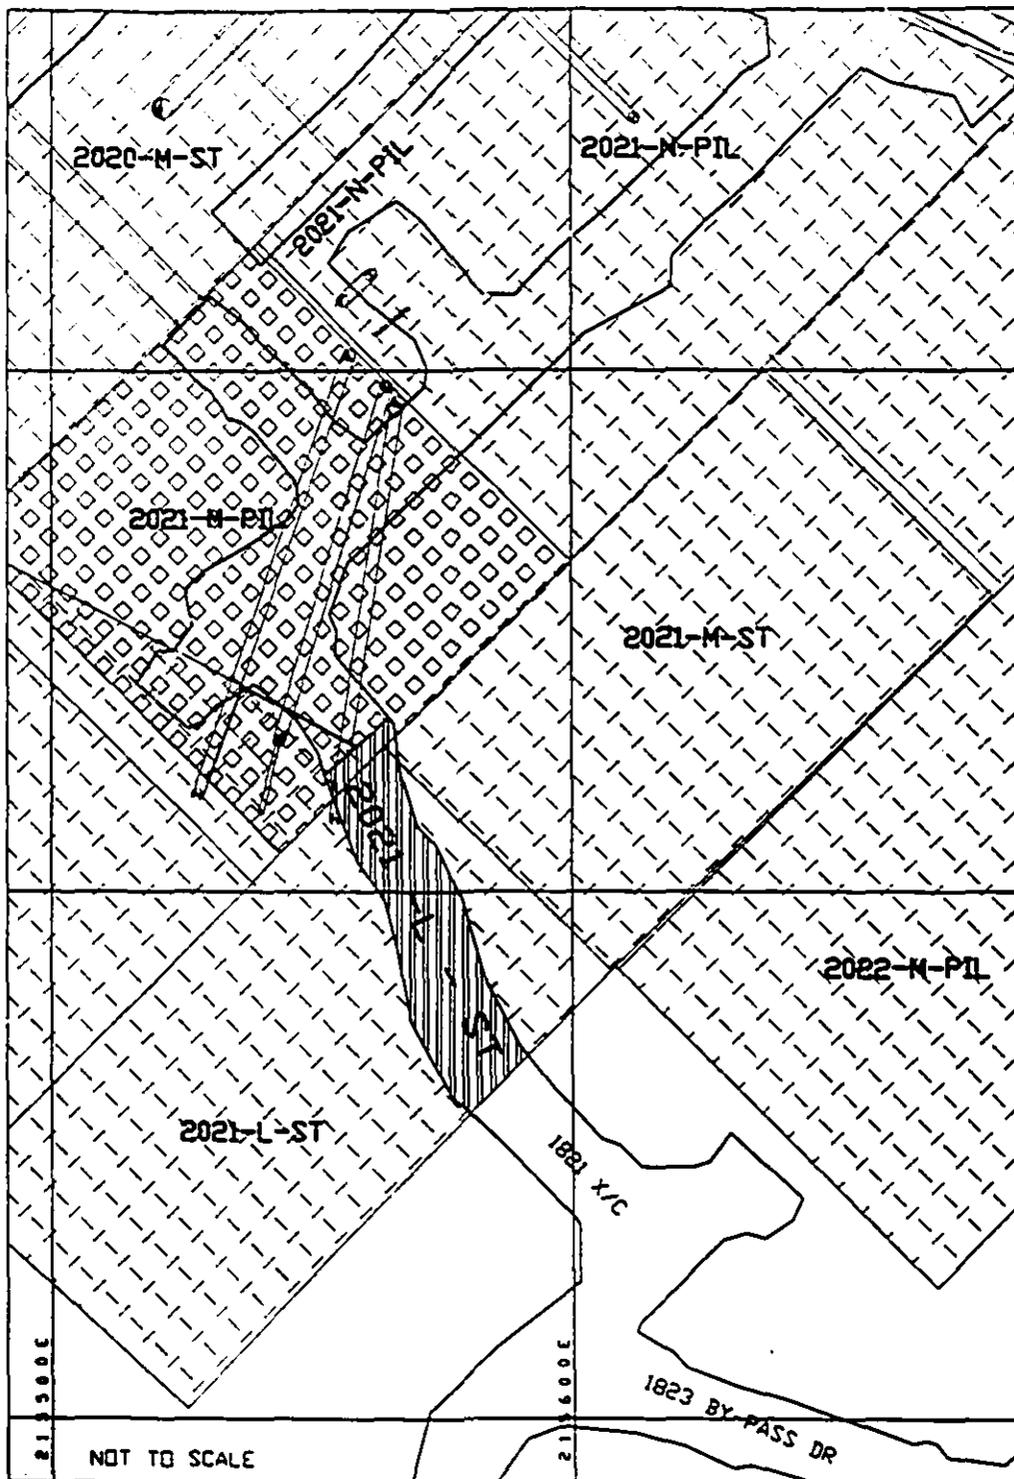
LEVEL PLAN SHOWING 2021-L-ST ROADHEADER DRIFT
